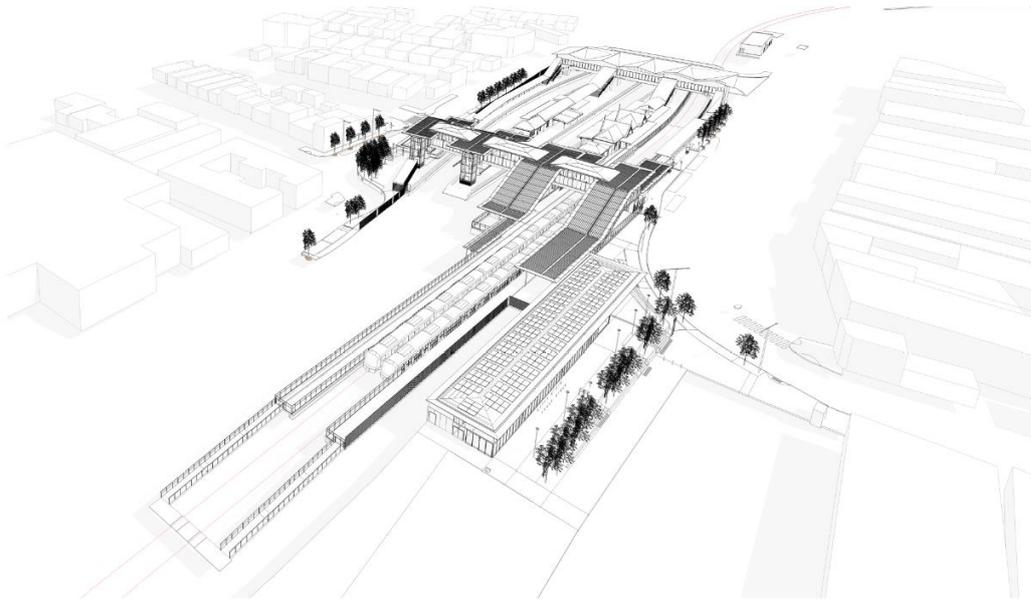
Aerial view of proposed site layout (HASSELL + Weston Williamson, Sydney Metro City & Southwest, Sydenham Metro Upgrade Project, Architecture General Arrangement—Isometric View—South, Sheet 1/1 A1).
